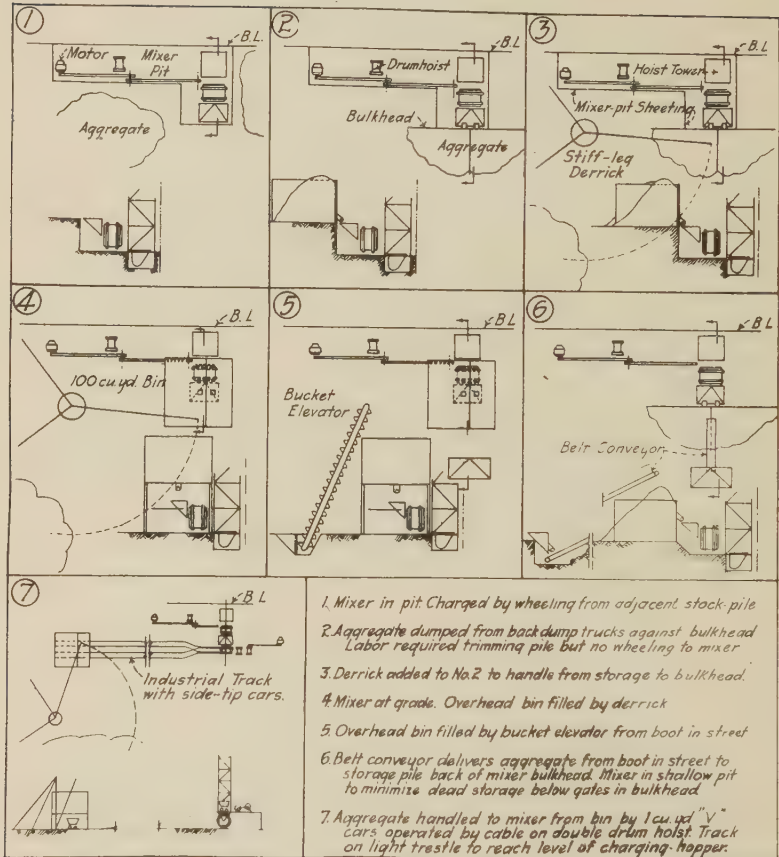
DETAILS OF SEVEN DIFFERENT PLANT LAYOUTS.
